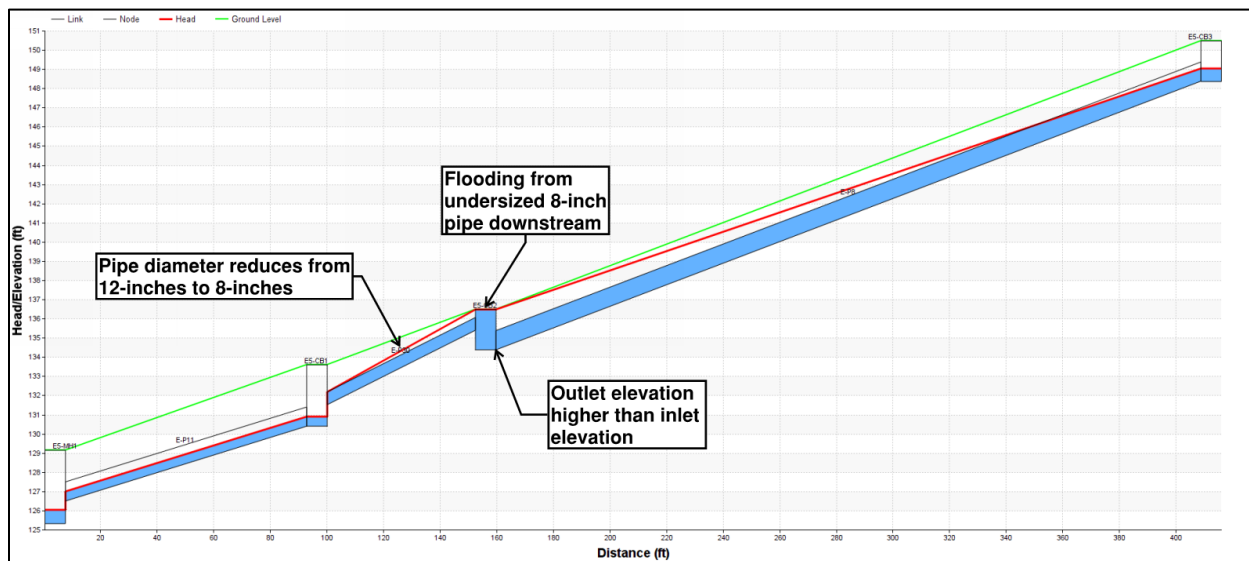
PROFILE OF BOTTLENECK AND RAISED OUTLET ALONG 1ST STREET
